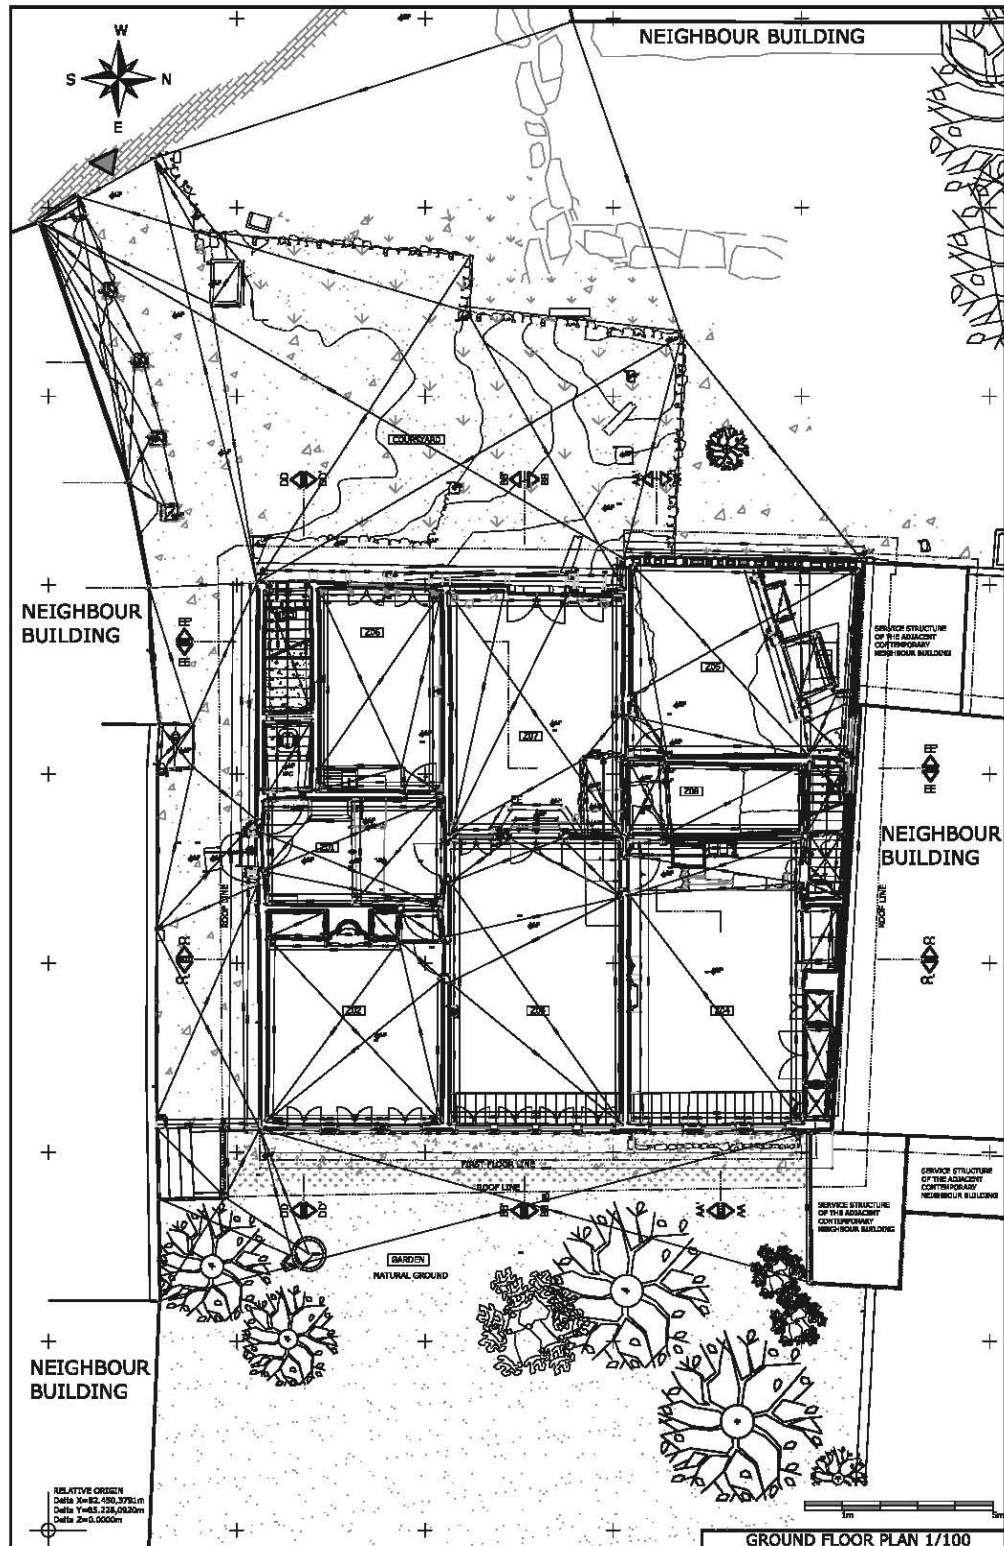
Ground Floor Plan: 1/200 (presented in 1/100 at Jury)
